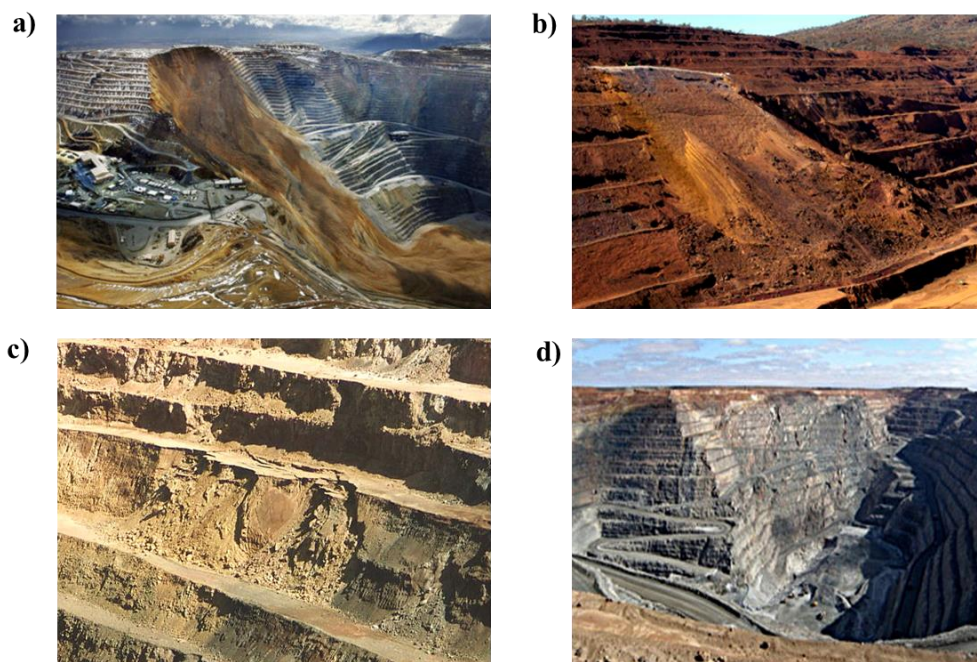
Different types of pit slope performance. a) Global circular failure, b) Inter-ramp scale failure, c) Bench slope local failure d) Stable open pit design
